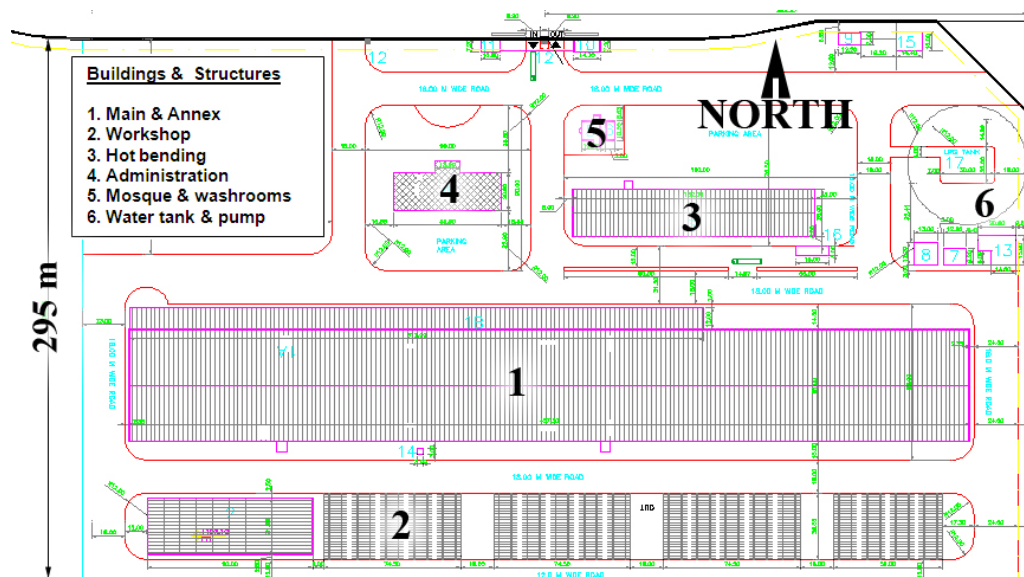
Layout of Al Jazira Steel Pipe Factory structures
